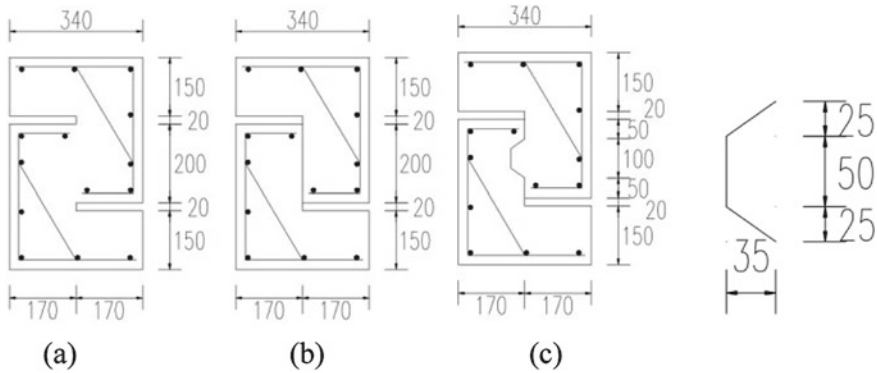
Specimen dimensions for a Monolithic, b Flat Dry and c Single Keyed Joints
